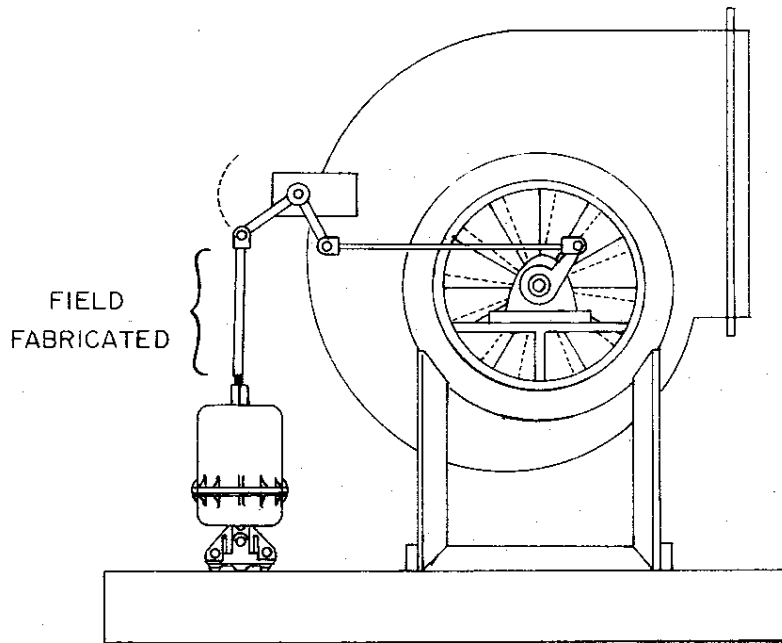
See Pipe and Bar Stock Applications (page 6)
